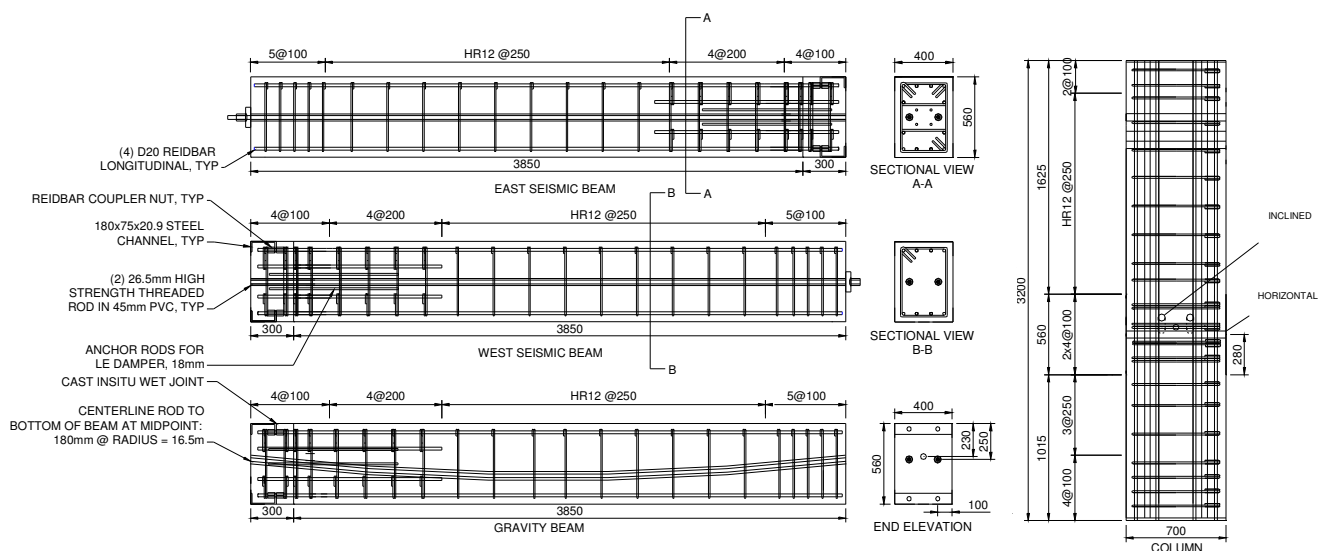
Reinforcing detail for the beams and columns (Solberg 2007)
